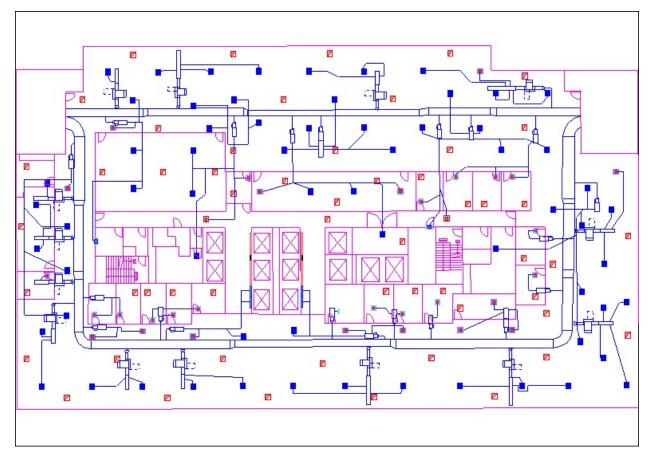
Duct layout for intervention floor. The control floor's duct layout is similar.
